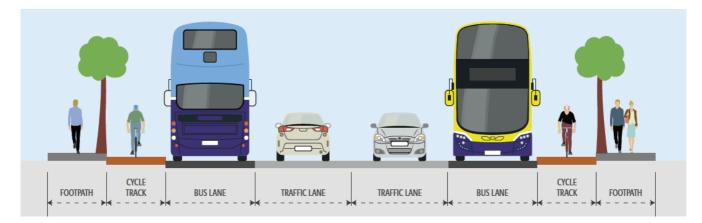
Typical BusConnects Road Layout (as per the PDGB)
